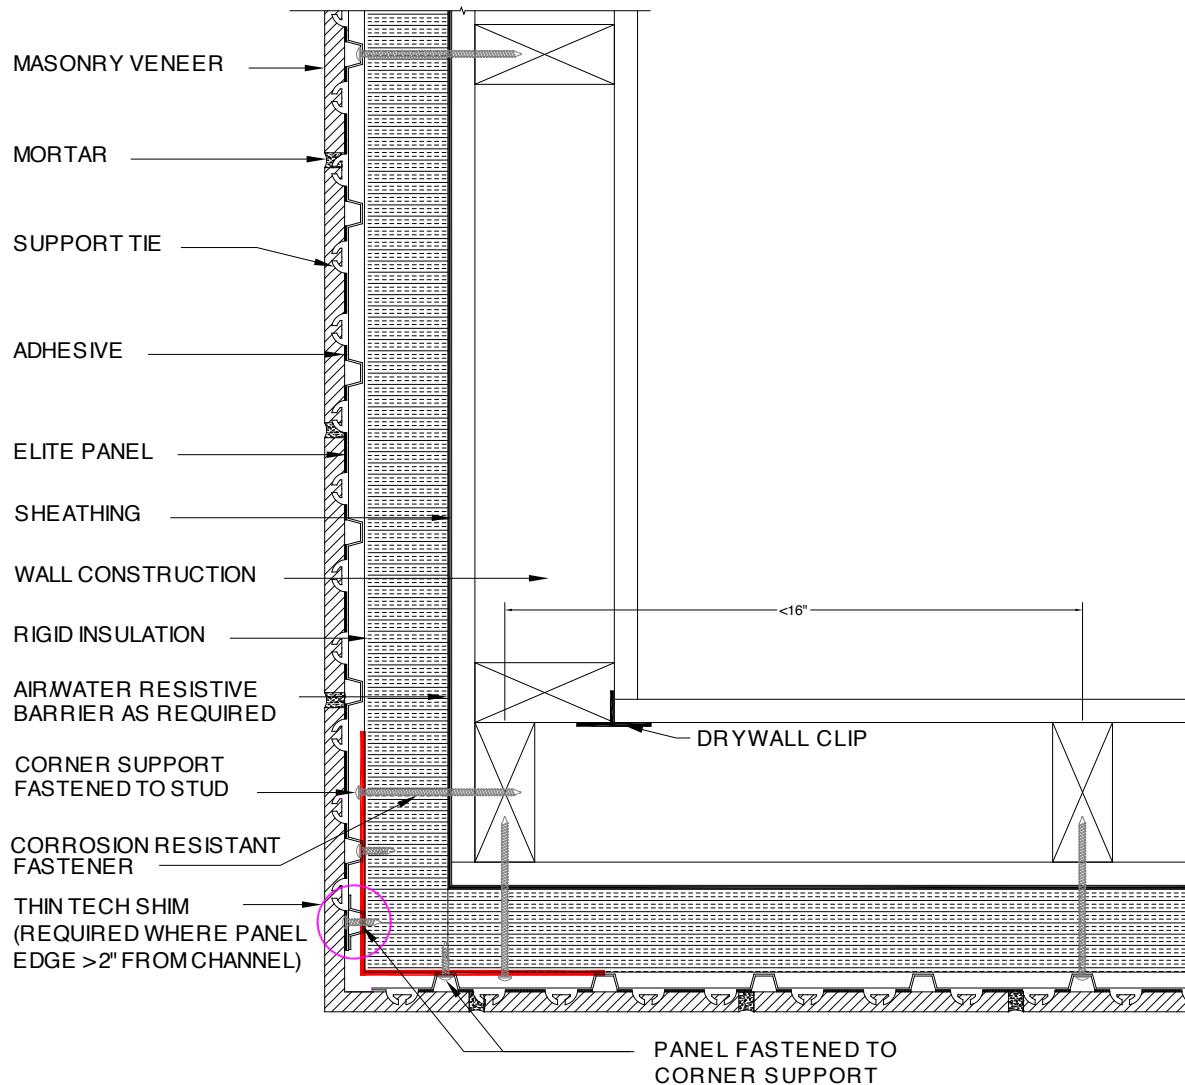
CORNER SUPPORT ON 2 STUD CORNER WITH 2 IN. INSULATION AND THIN TECH SHIM ADDED AS SUPPORT
